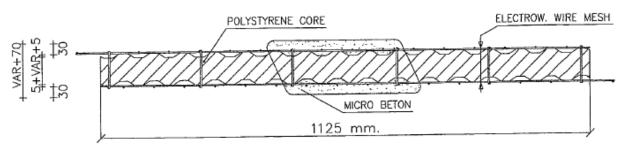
Emmedue Single Panel PSM80 Details (Ref. 1, p.7)
